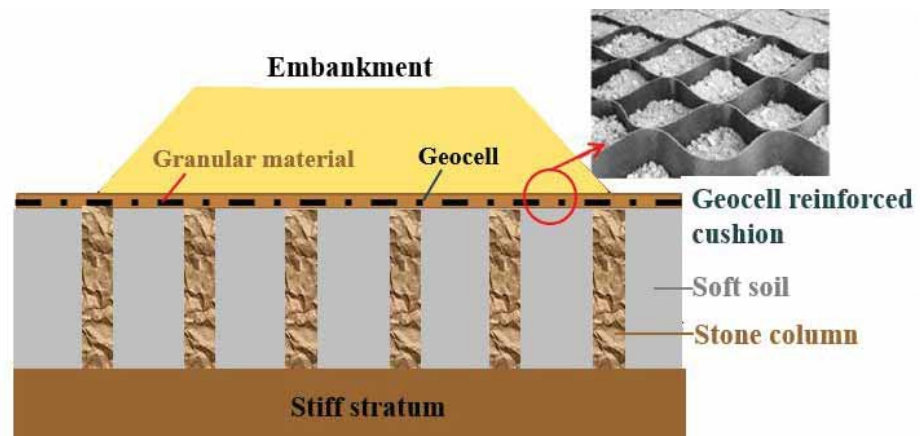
Schematic of geocell reinforced and stone column supported embankment
